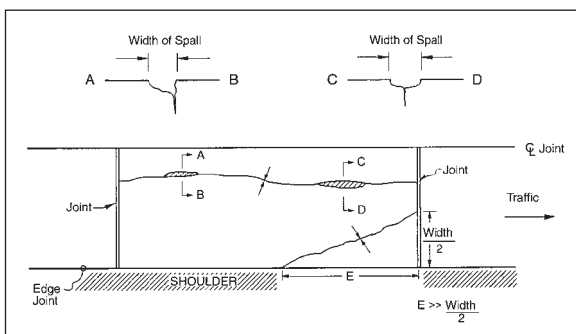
Distress Type JCP 3 – Longitudinal Cracking
